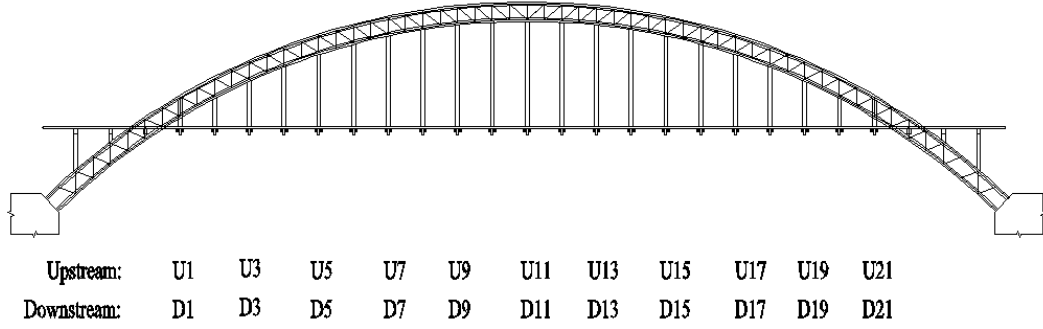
Hanger cable arrangement of Sanan Yongjiang Bridge
